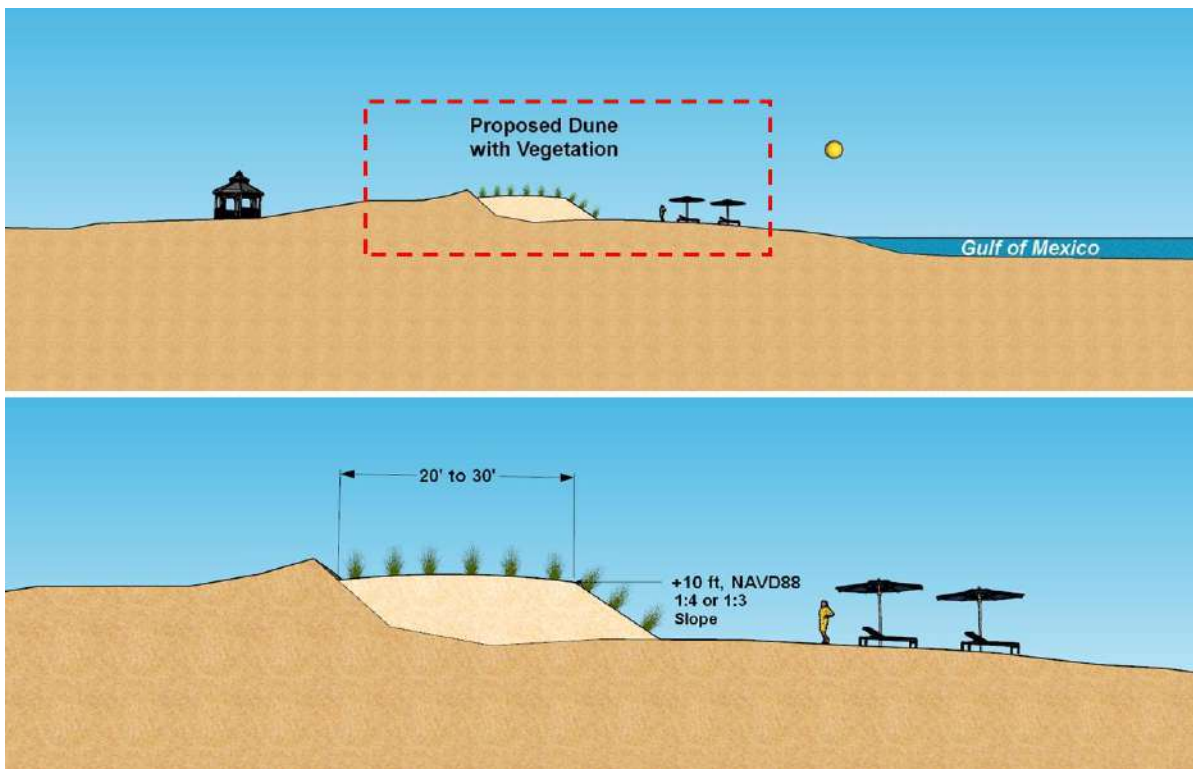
Typical Type B Dune overview (above) and detail view (below).
